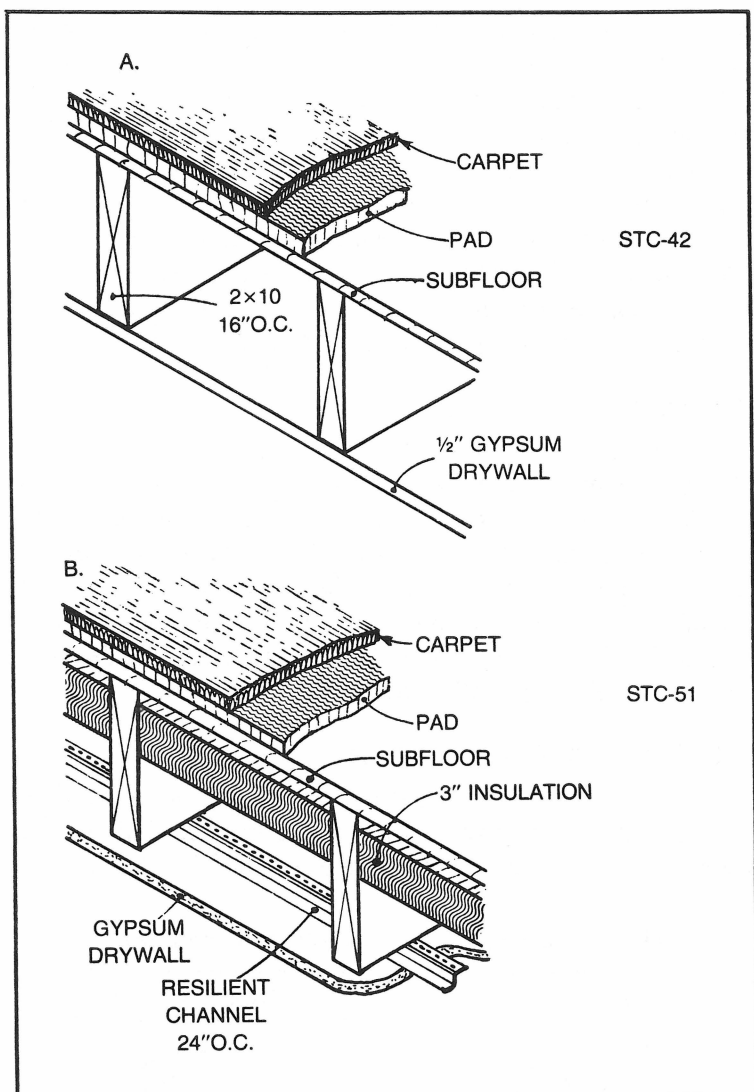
Two methods of protecting a studio from noise from the floor above with frame construction: (A) with normal gypsum board ceiling and (B) with resiliently mounted ceiling and insulation in the air space.
